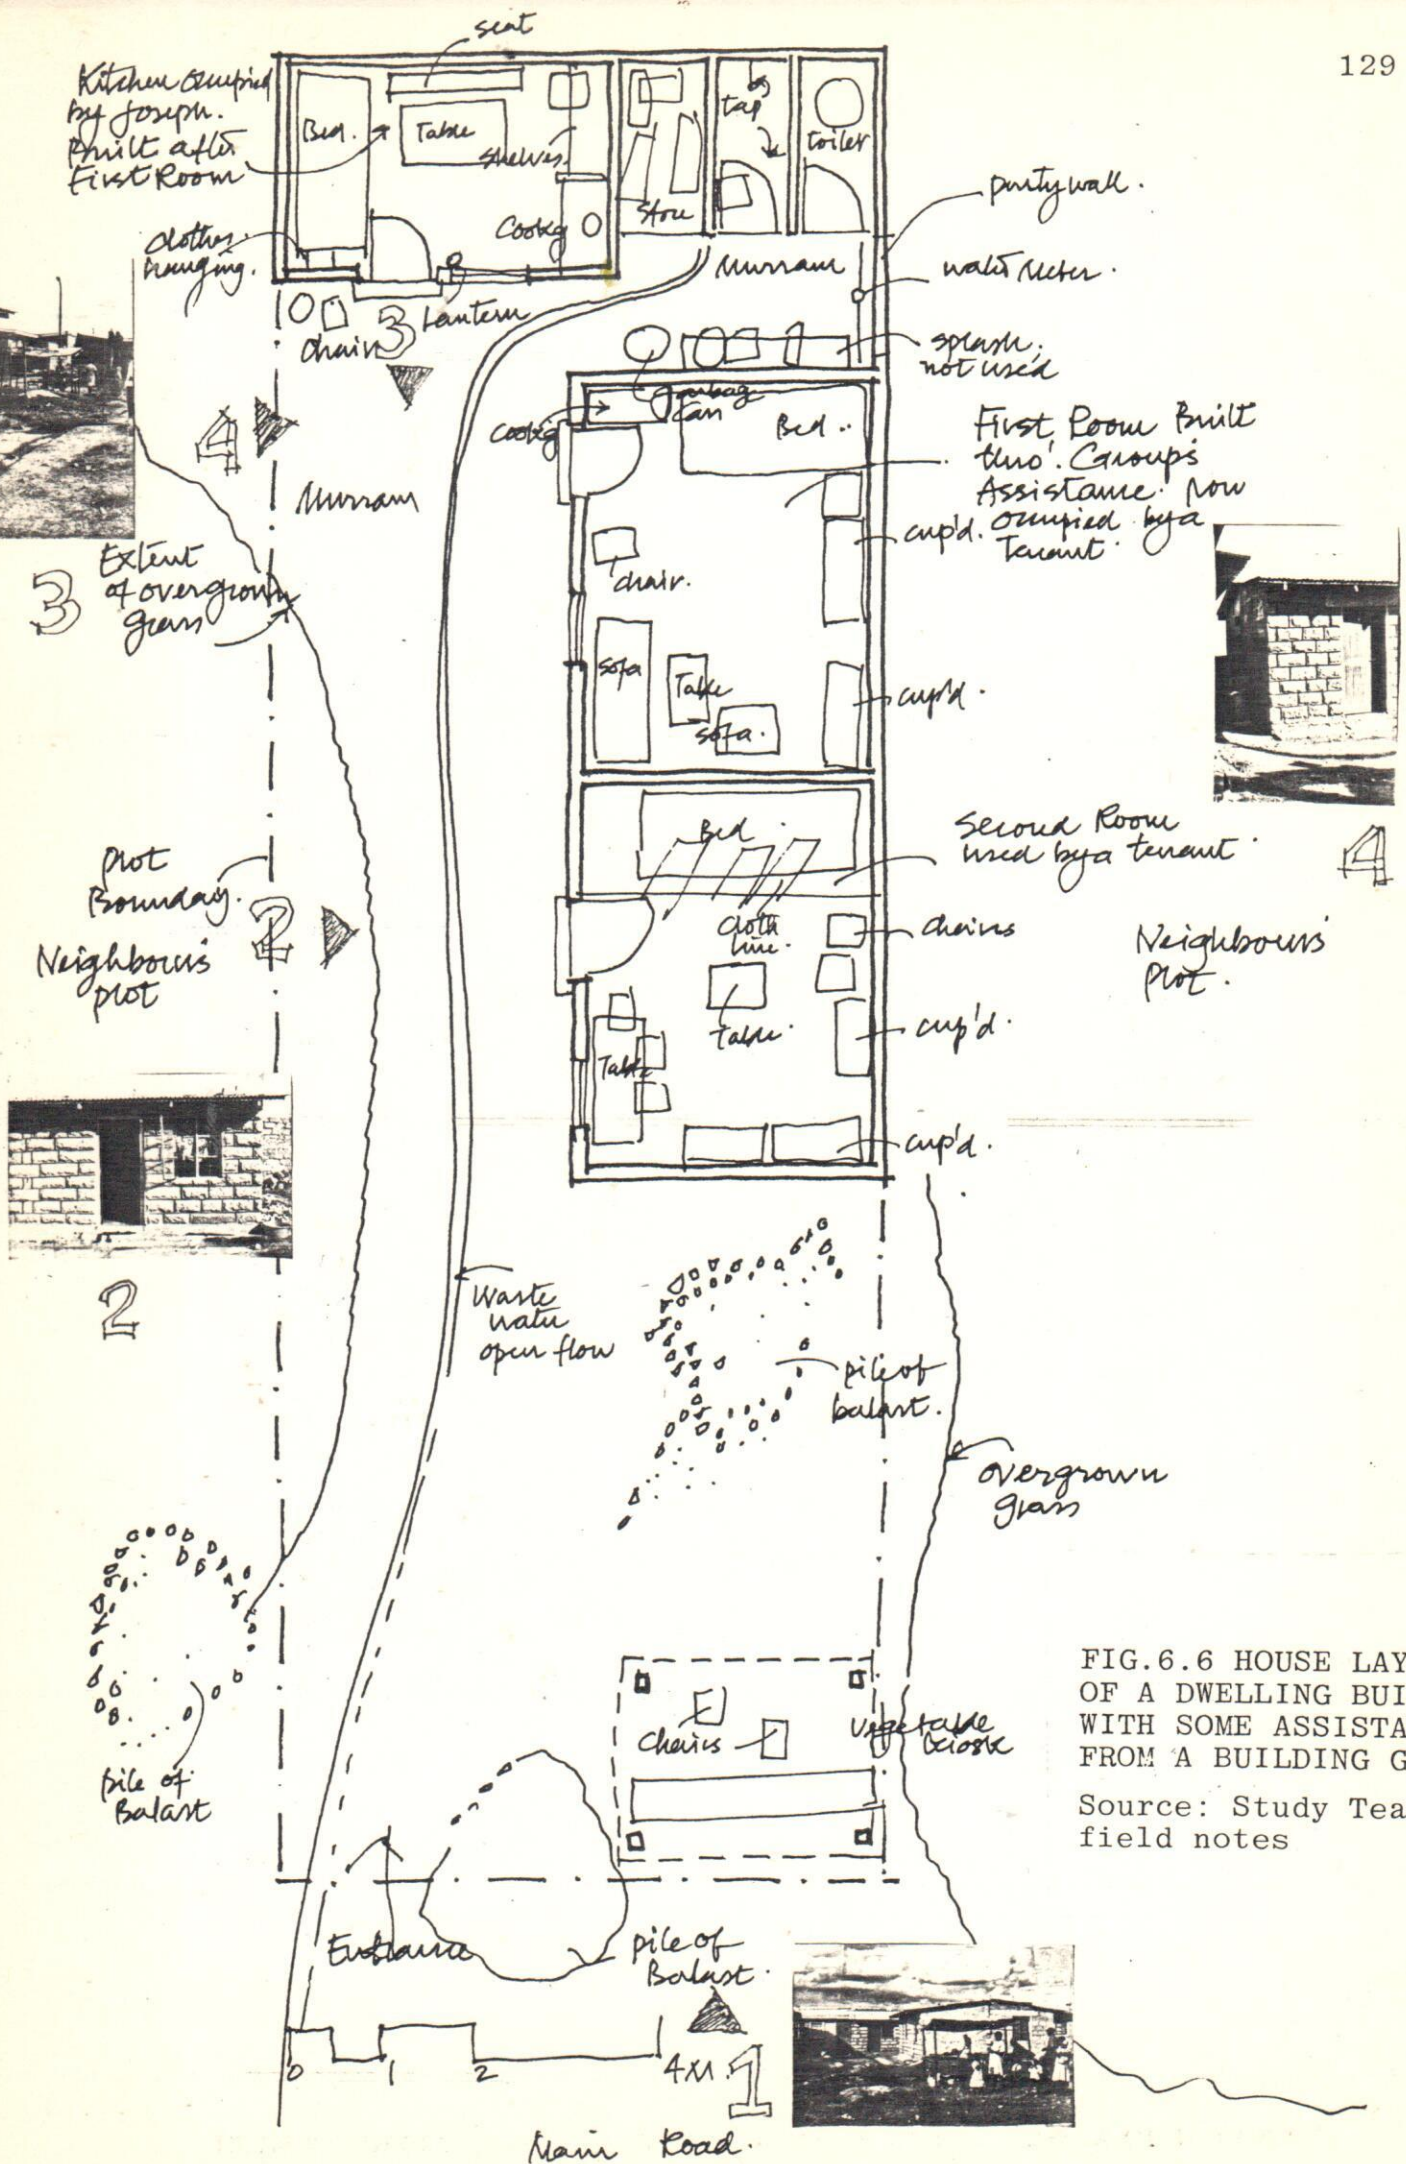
HOUSE LAYOUT OF A DWELLING BUILT WITH SOME ASSISTANCE FROM A BUILDING GROUP
